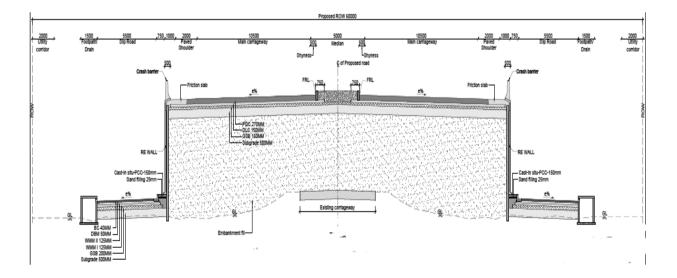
TCS-6A Typical Four Lane Underpass Cross Section with Slip Roads in the Existing Road
